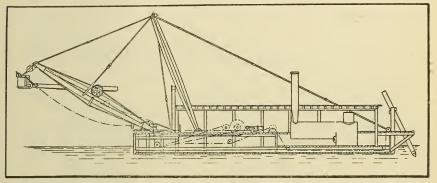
Dipper dredge, side view, showing arrangement of machinery.
